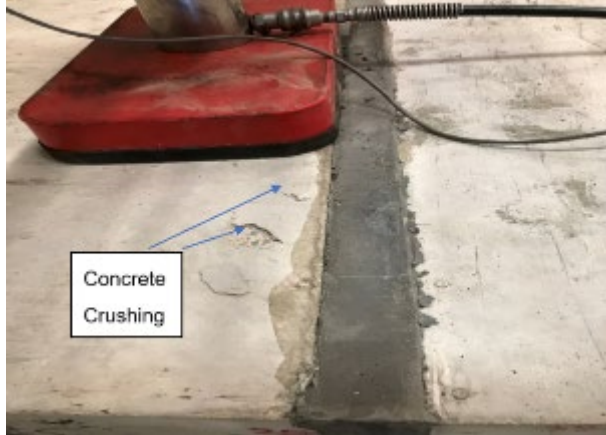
Concrete crushing at the top of the slab for J3 slab 2 at failure
